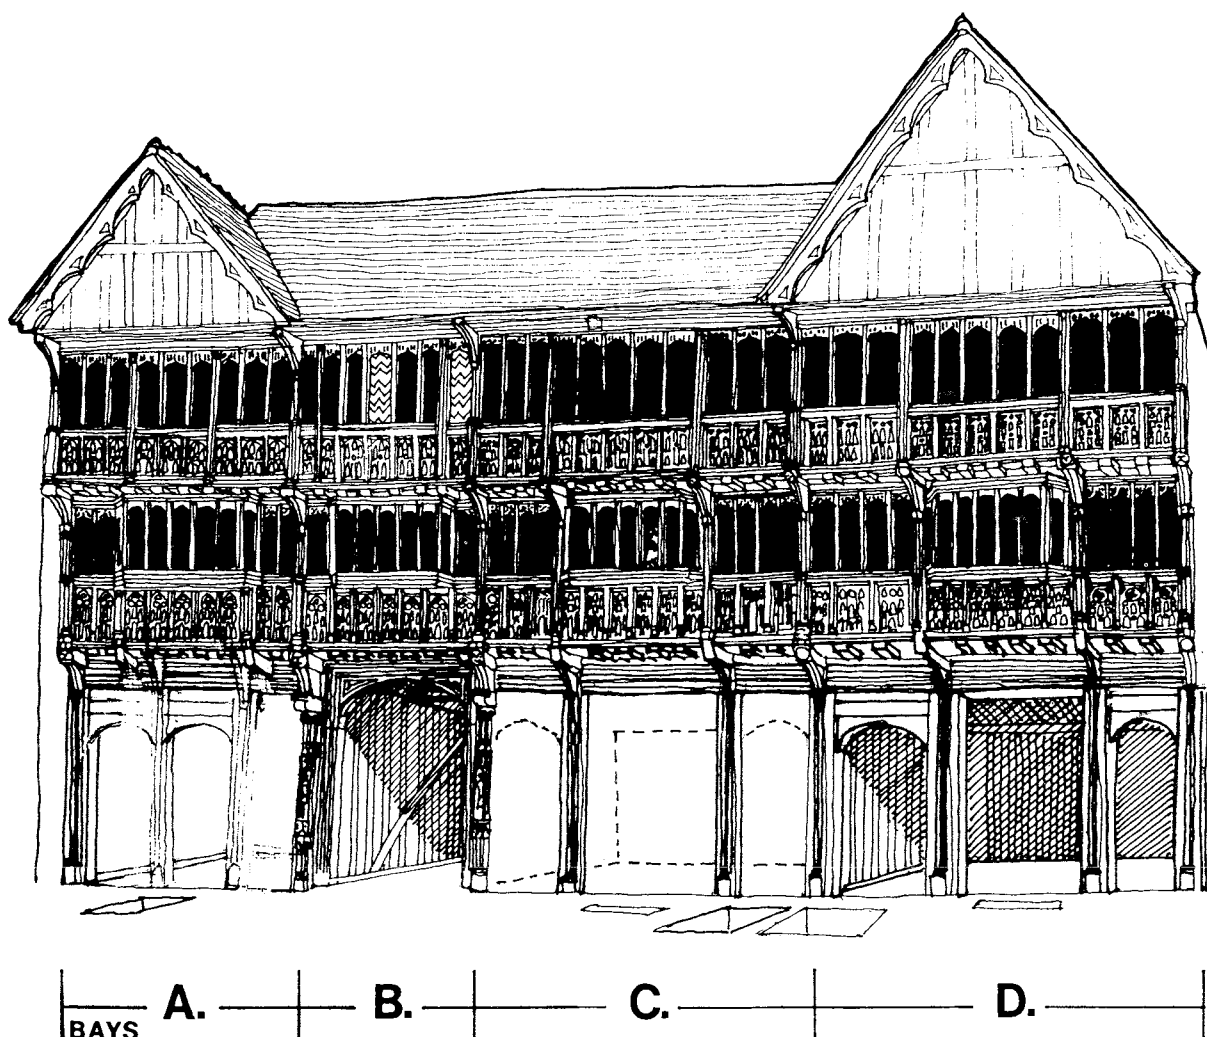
The Red Lion, Colchester. Reconstruction of street frontage elevation.
